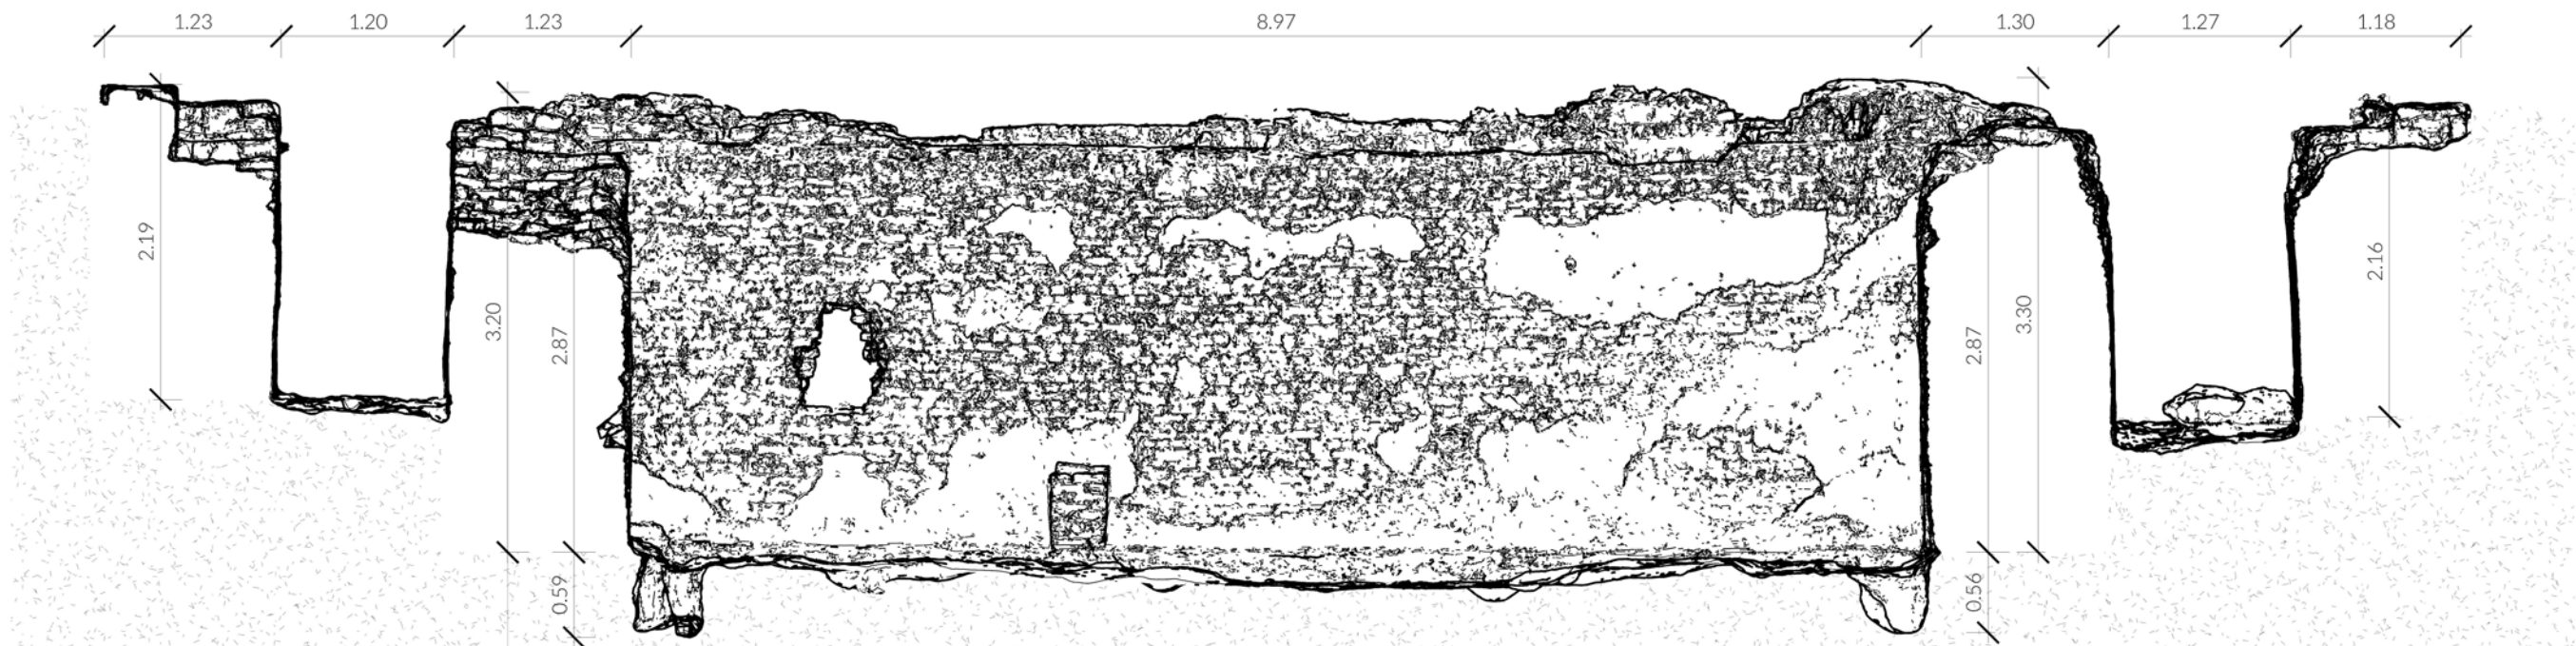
Section through YKK6 - YKK - YKK1, south wall, 1:50
